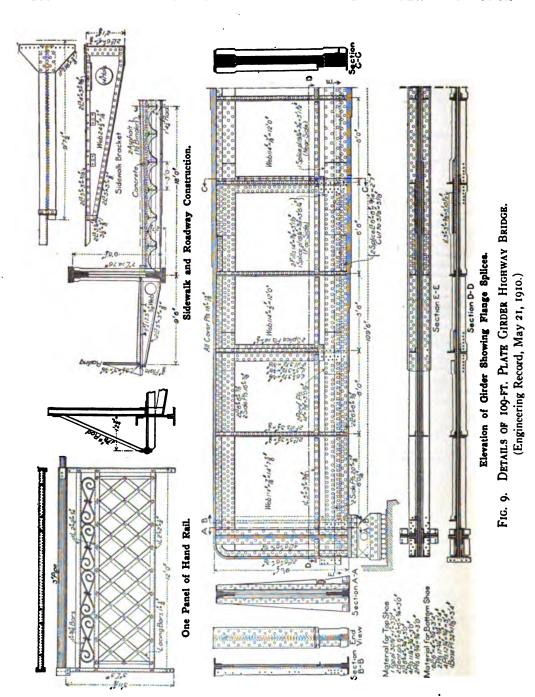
DETAILS OF 109-FT. PLATE GIRDER HIGHWAY BRIDGE. (Engineering Record, May 21, 1910.)
